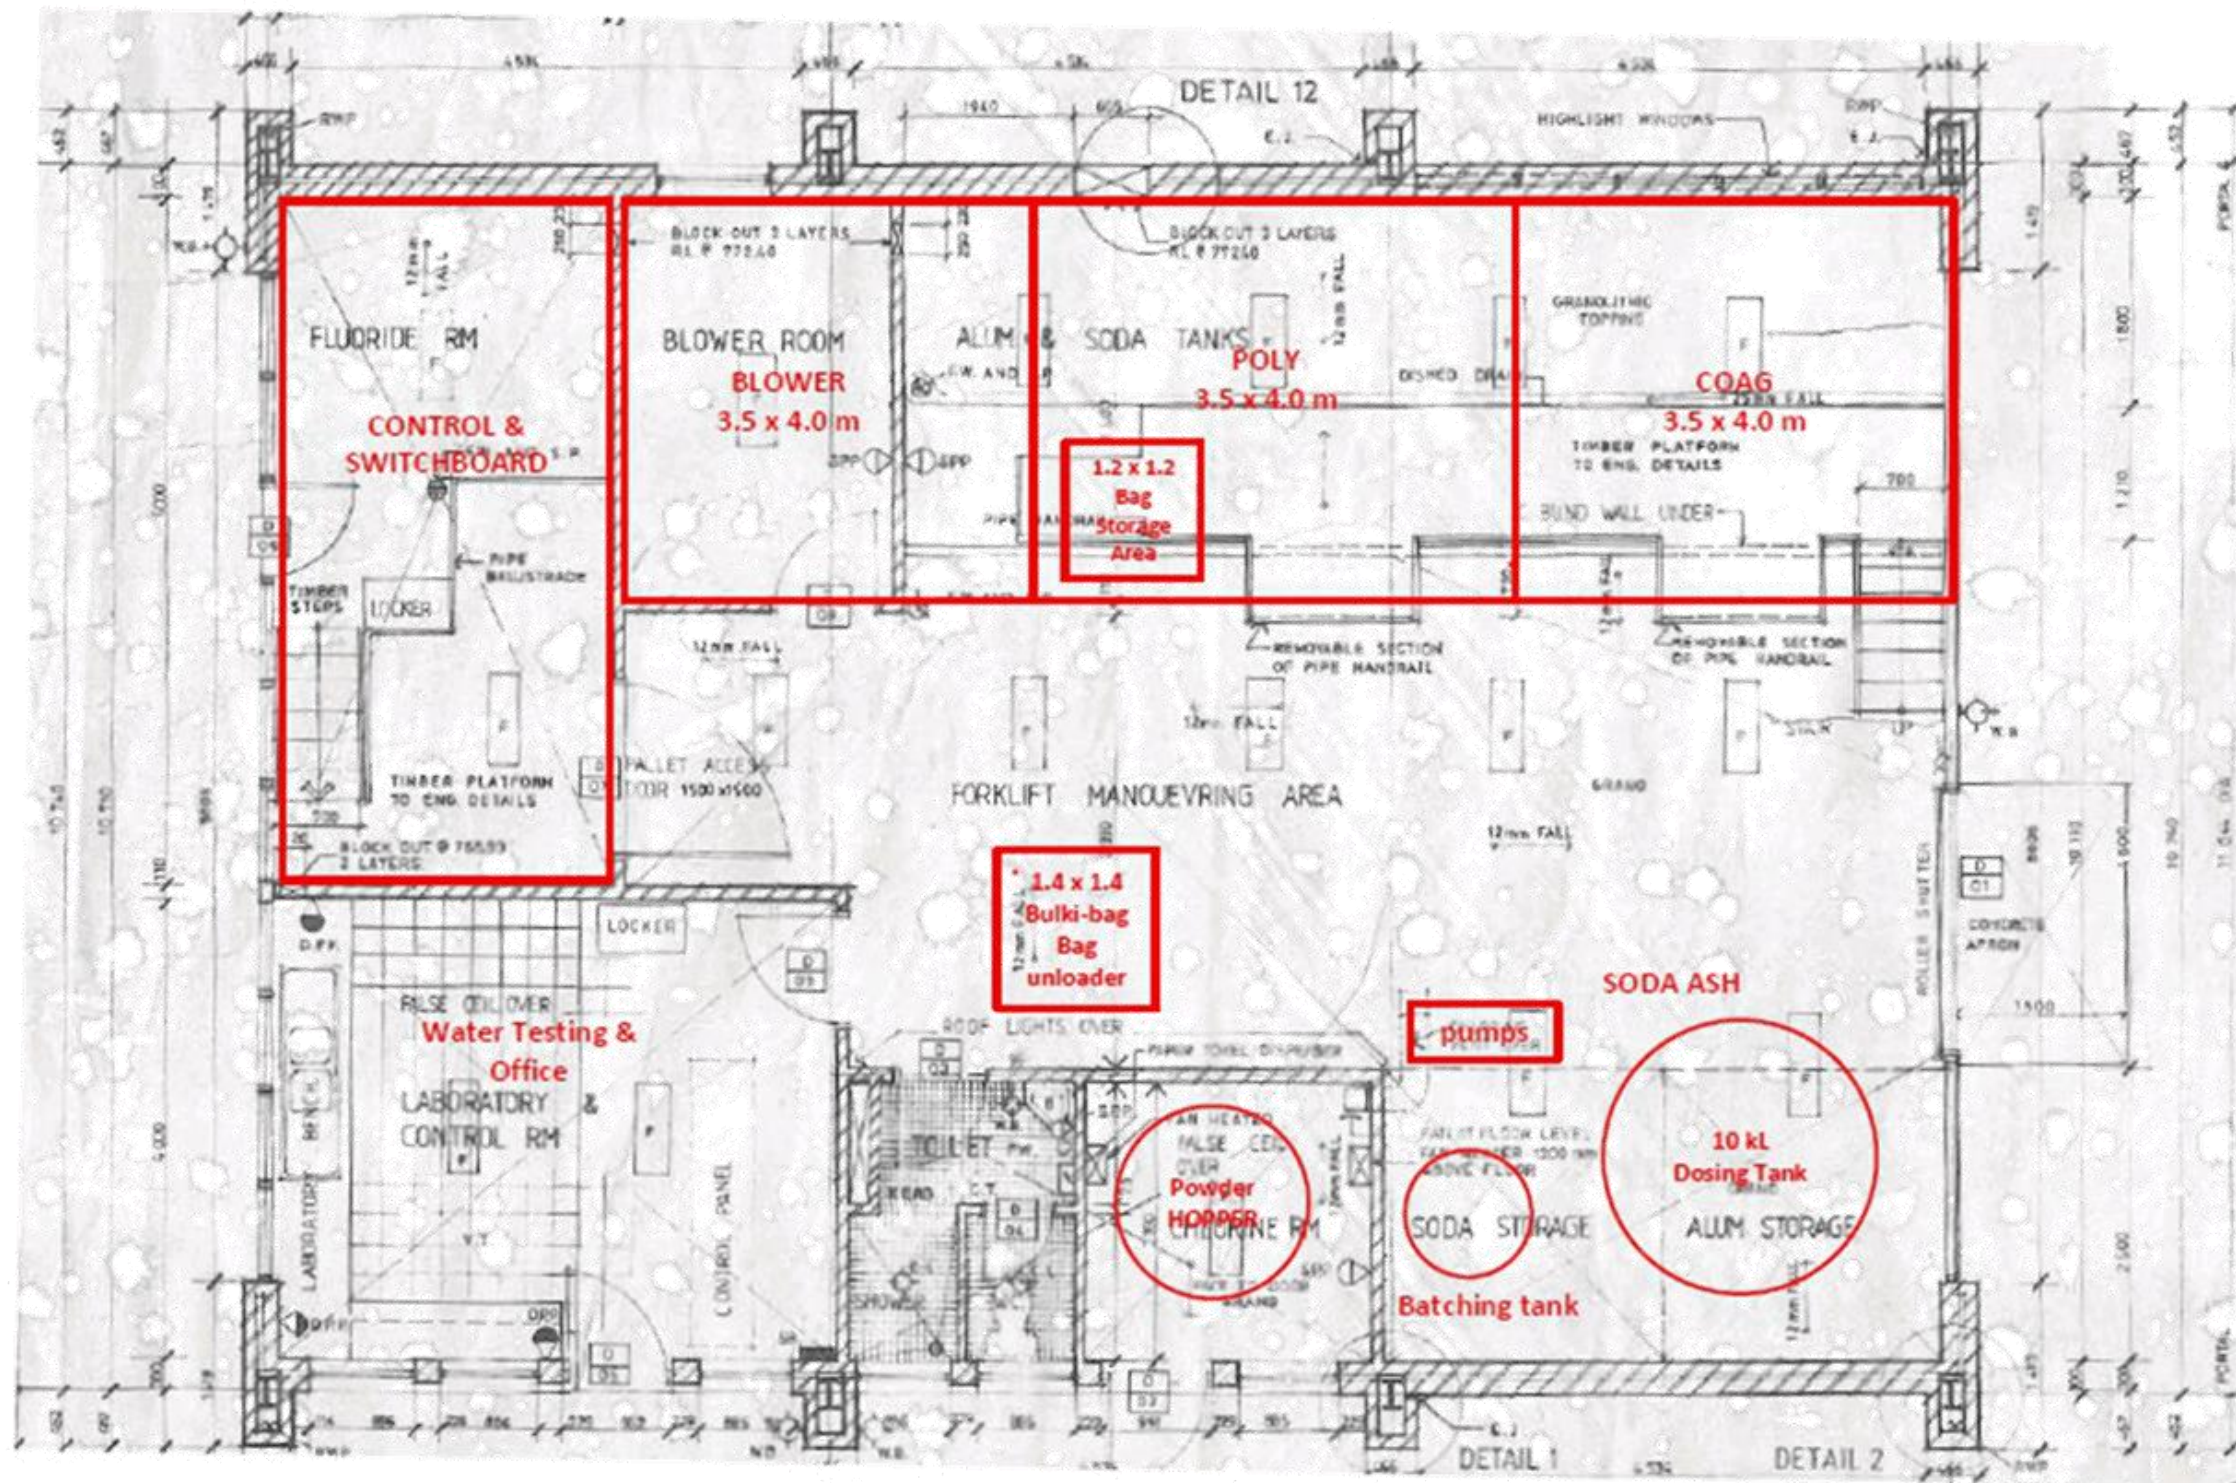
Bombala Control Building Layout for Option 1 (Upgrade existing plant)
